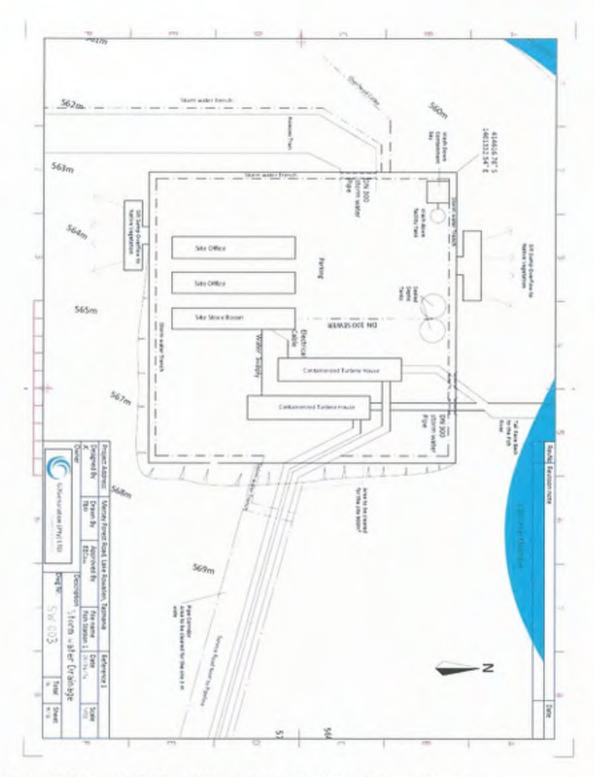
Proposed Fish River Power Station site plan and stormwater system.
